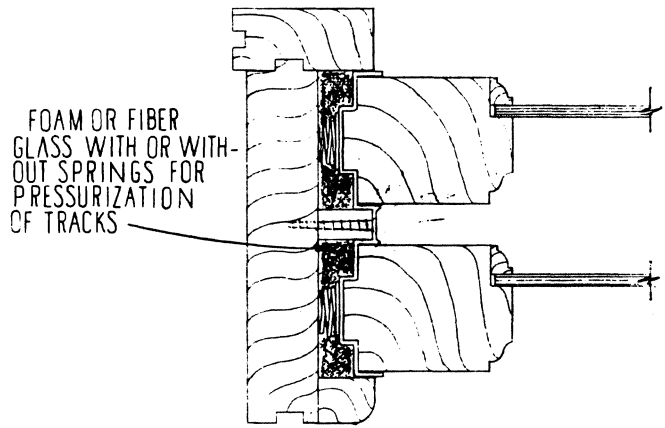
Double-hung wood prime window with pressurized track weather-stripped at head, sill and meeting rail
